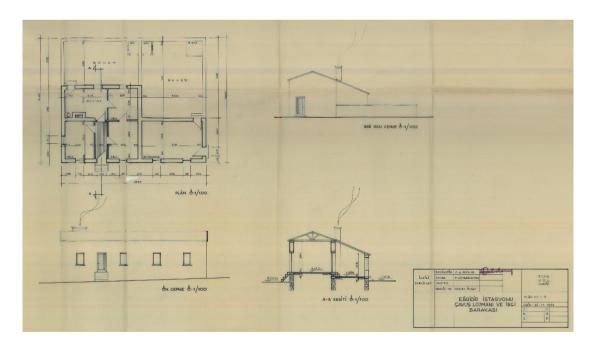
Drawings of Bunkhouse in 1966 (TCDD Archive)
